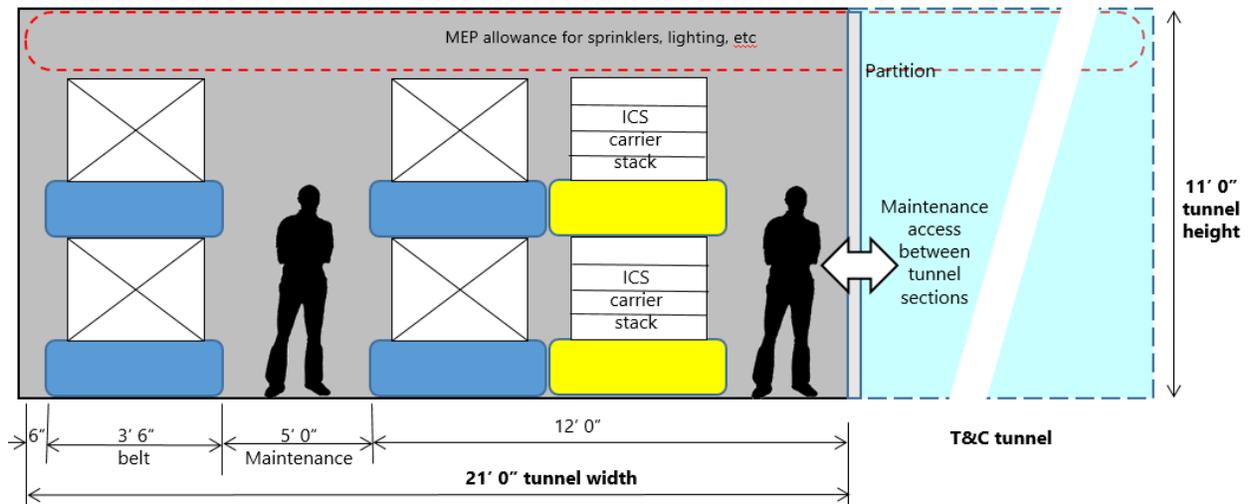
Modified tunnel configuration with ECB storage in tunnel
